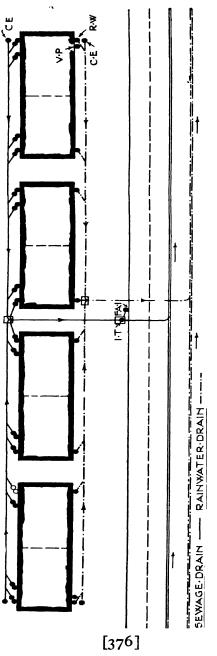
Plan of combined drains for eight houses discharging to (a) sewer, and (b) surface-water drain. Surface water at rear drain.
